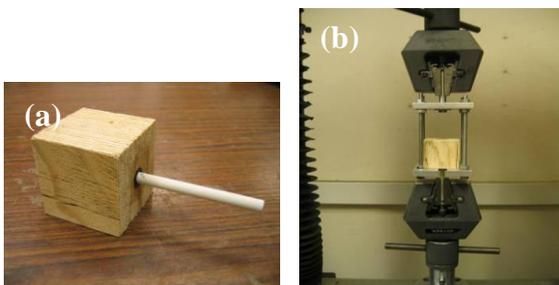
(a) Single-ended pull-out test specimen and (b) Experimental set-up for pull out test.
